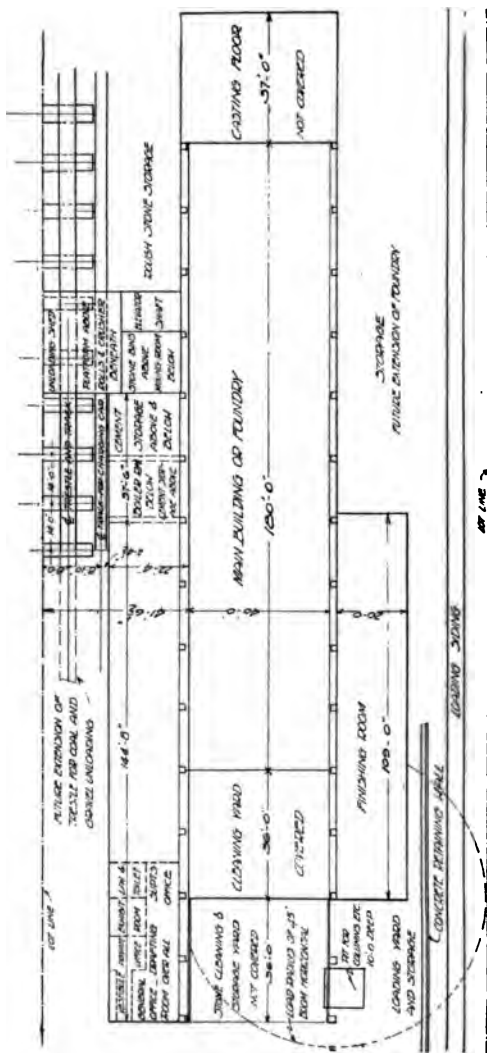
PLAN AND LAYOUT OF PLANT No. 1
